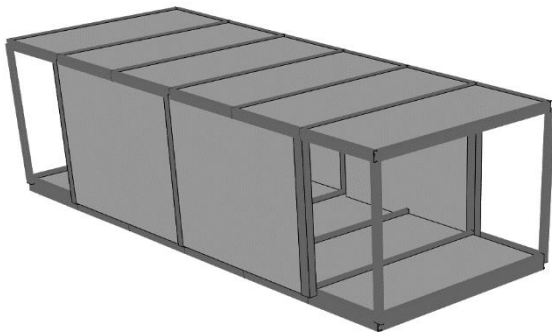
2. Type 1 module with 100mm thick RC infill wall
